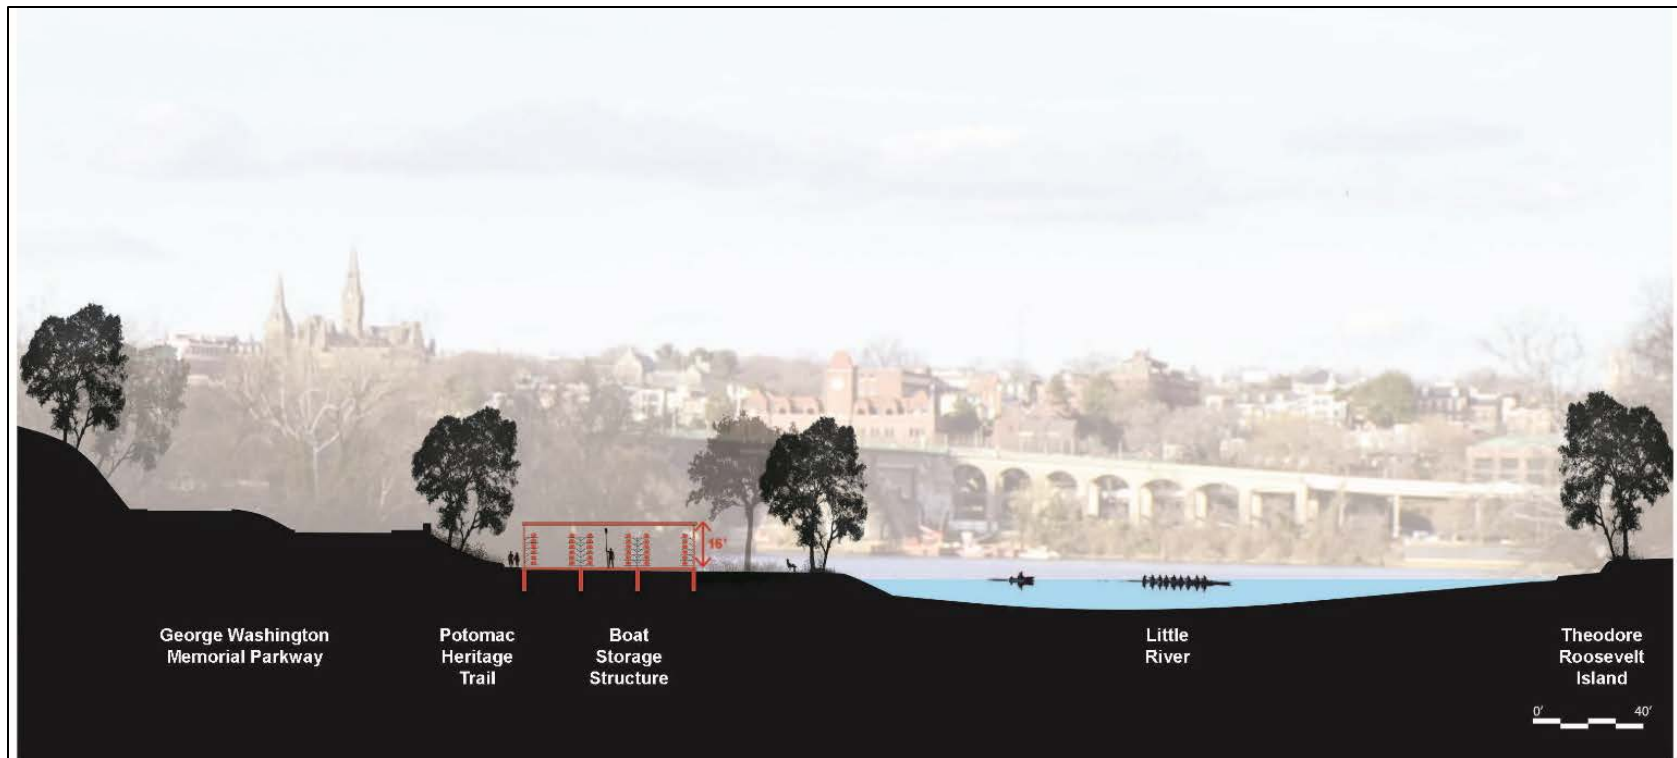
CONCEPTUAL ELEVATION OF BOATHOUSE FACILITY AT LOWER ROSSLYN
